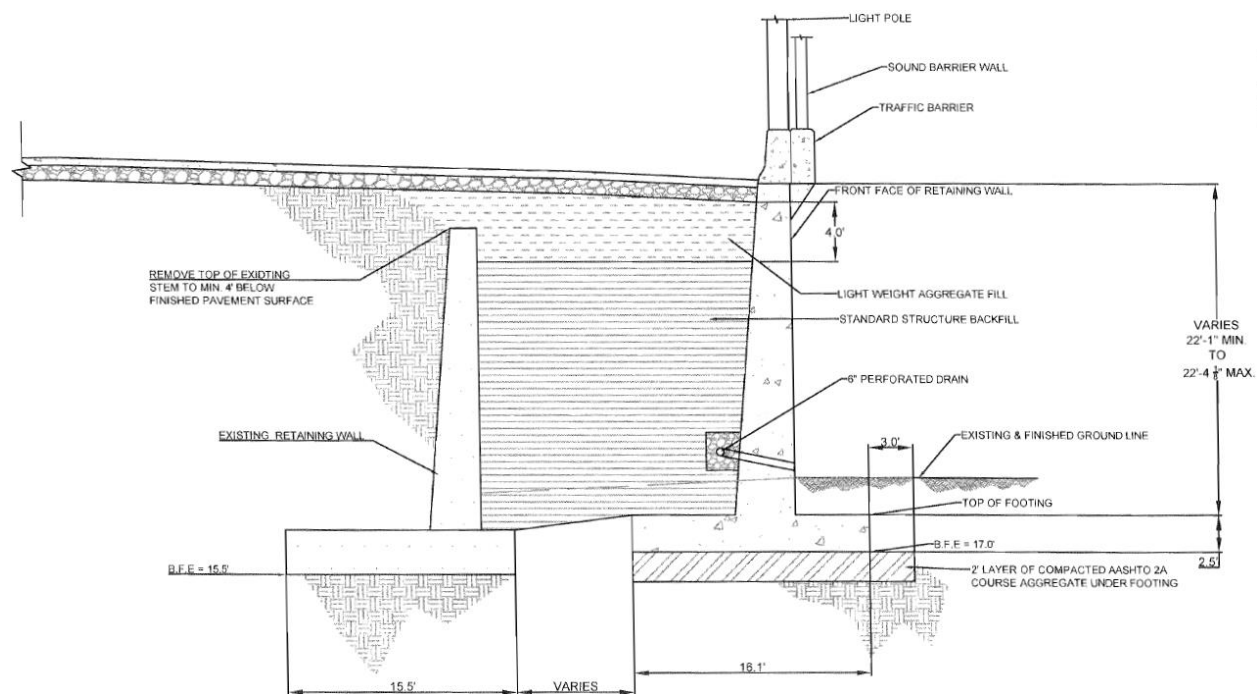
Typical cross section for Wall 12A (S-32472).
